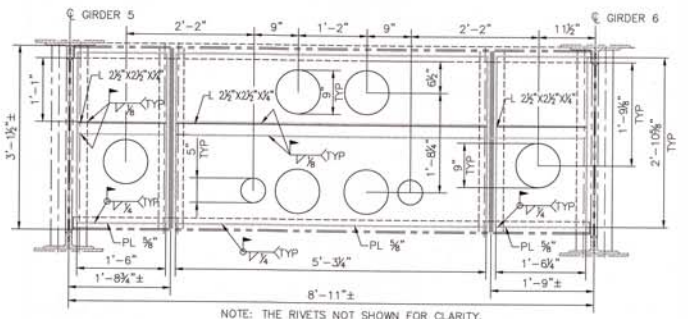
EXIST JACKING GIRDER RETROFIT AT PIERS 2, 3 & 4
